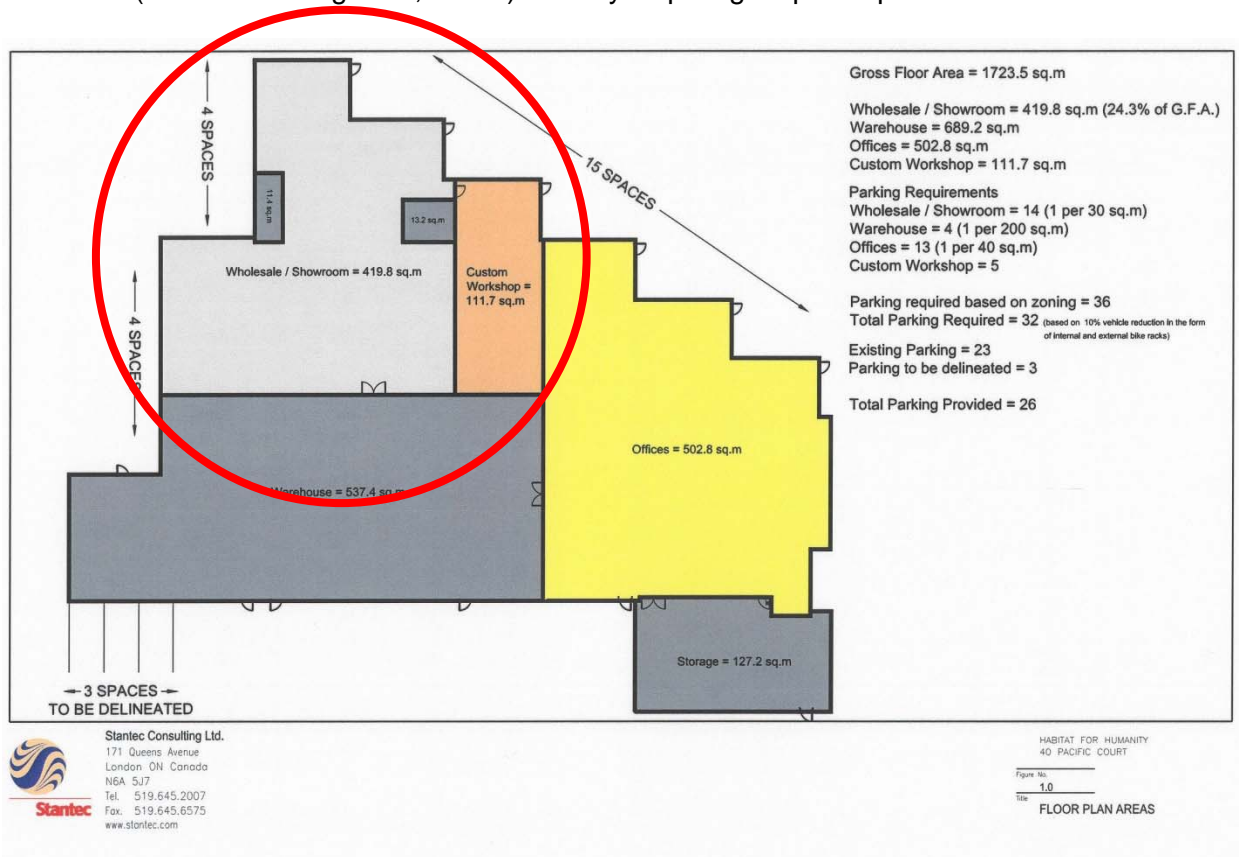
Proposed floor plan depicting the proposed Retail Store intertwined within a showroom area
